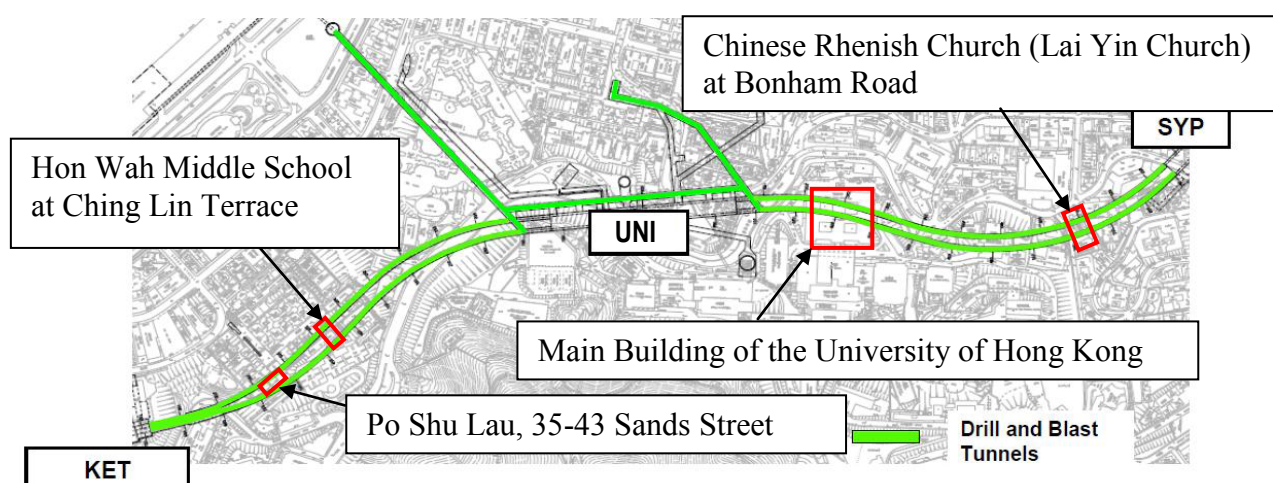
Tunnel Construction Methods, Drill and Blast- KET Station and Overrun Tunnel
